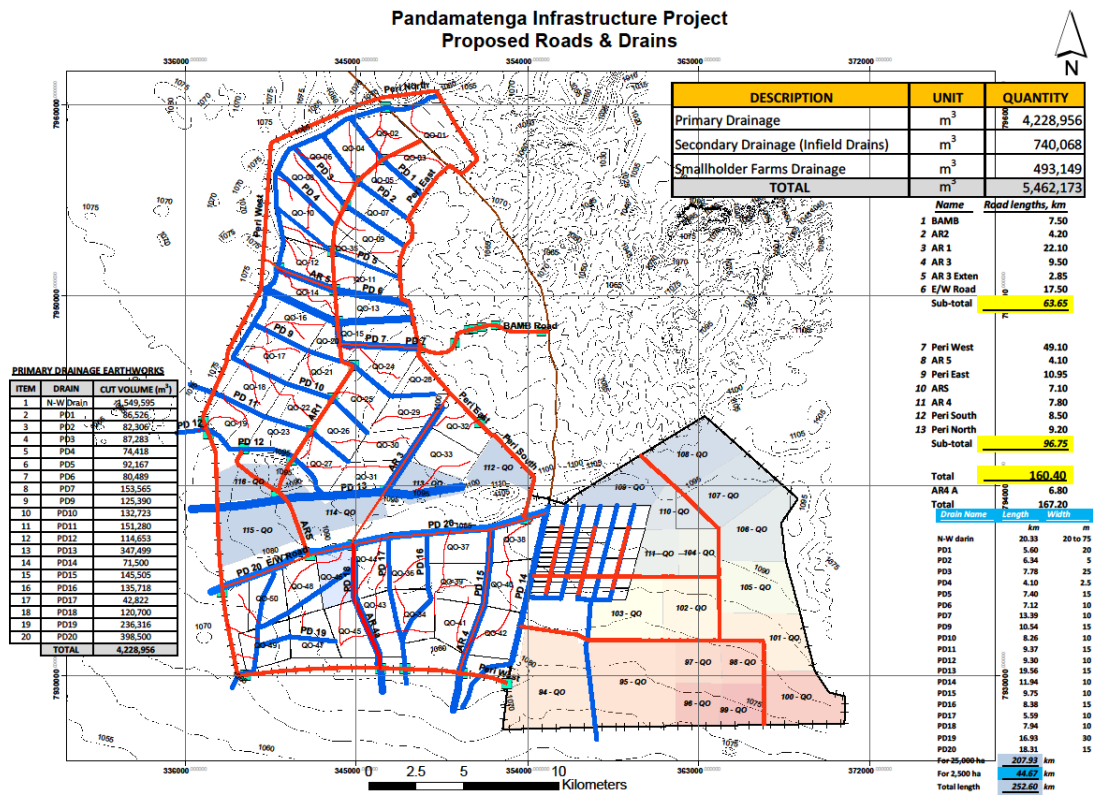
General layout of drainage system and access roads for existing farms (“Consultancy Services for Construction Supervision of Road Network and Drainage Systems for Pandamatenga Farms – Final Design” by DIWI in 2011)
